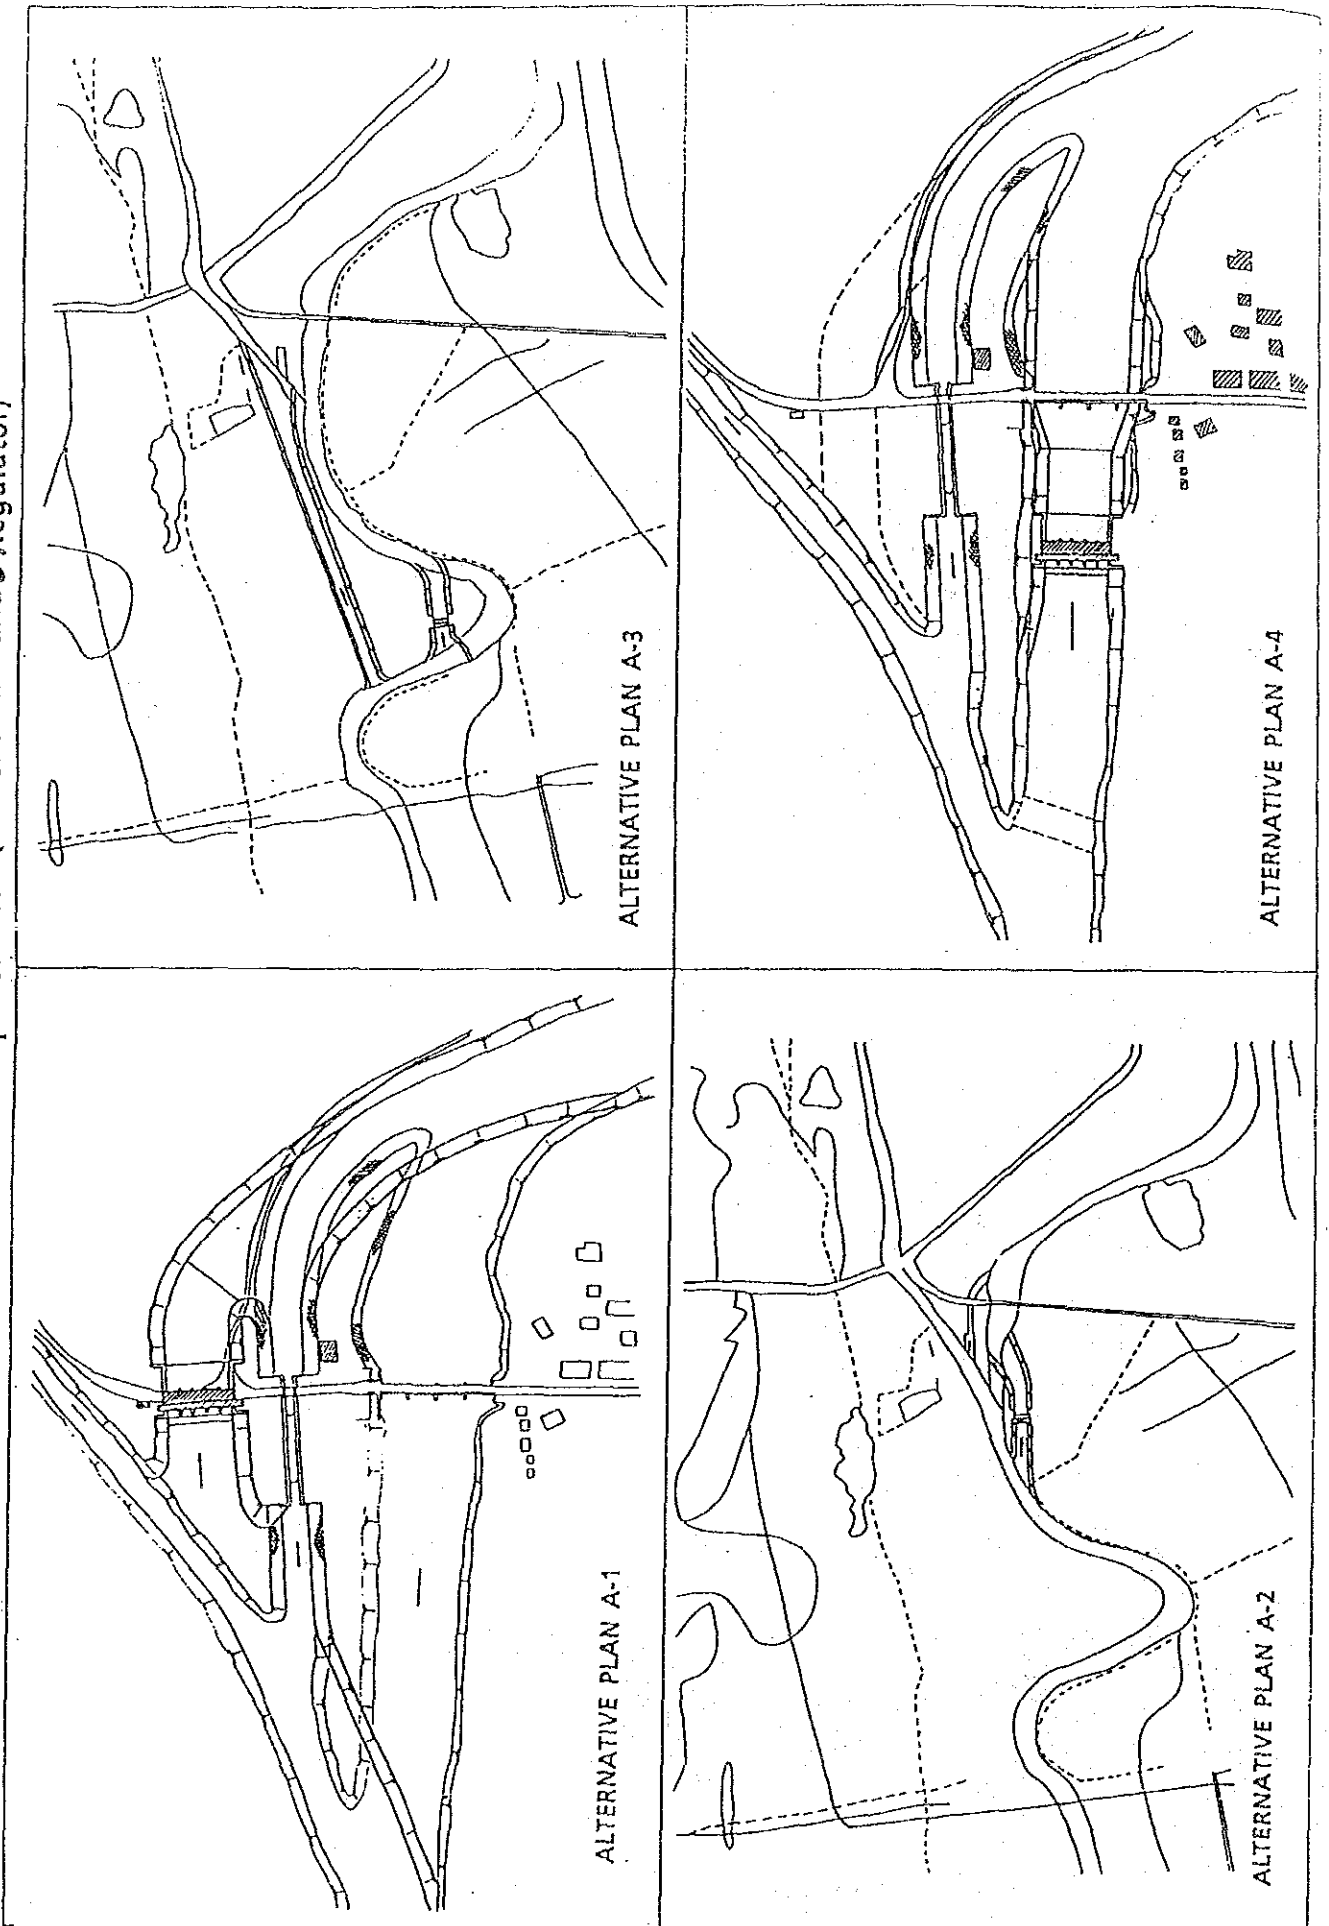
Alternative Plan of Proposed Site (Sakoula Regulator)
